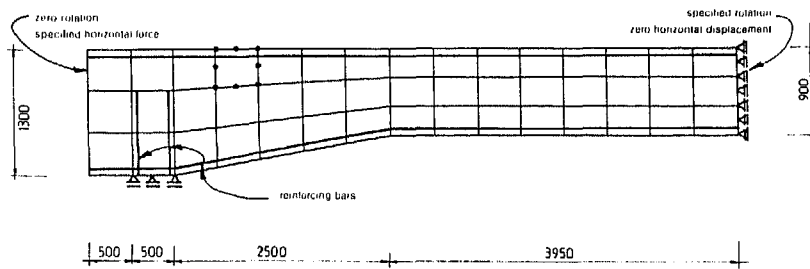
Finite Element Model for Tunnel Roof (Dimensions in mm)
